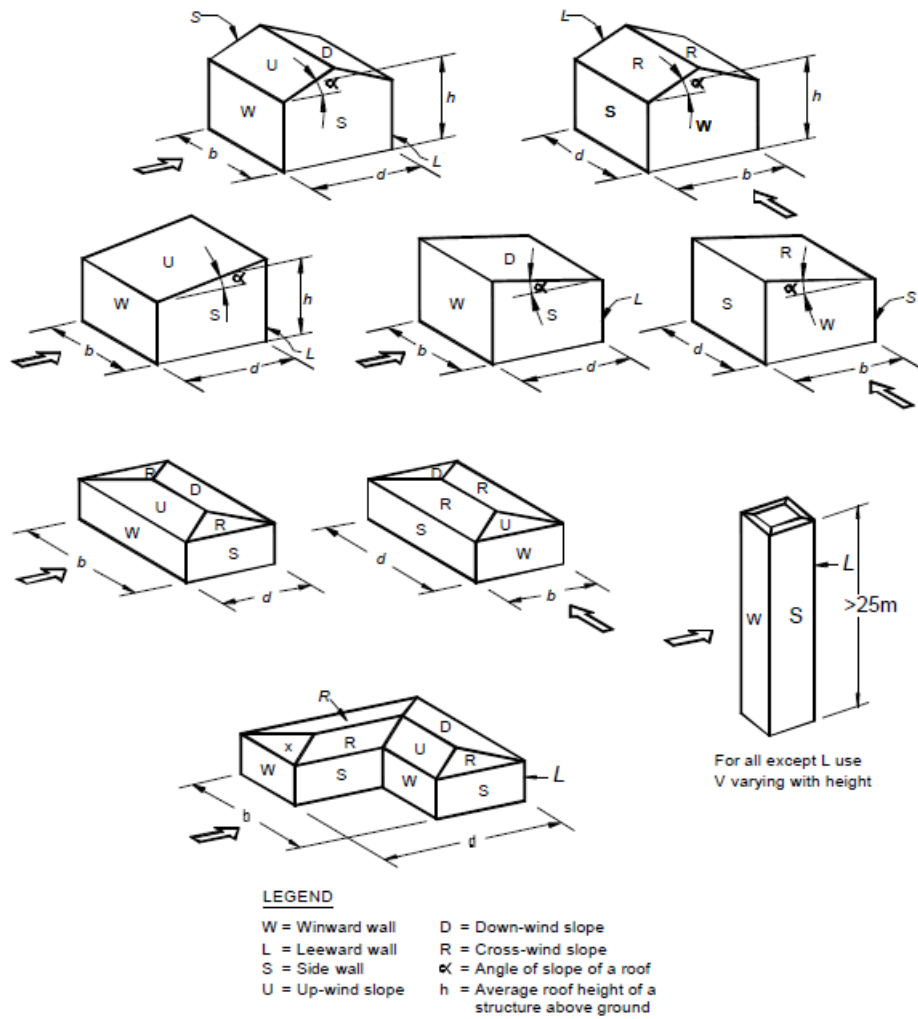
The shapes of roof as provided in MS 1553:2002
